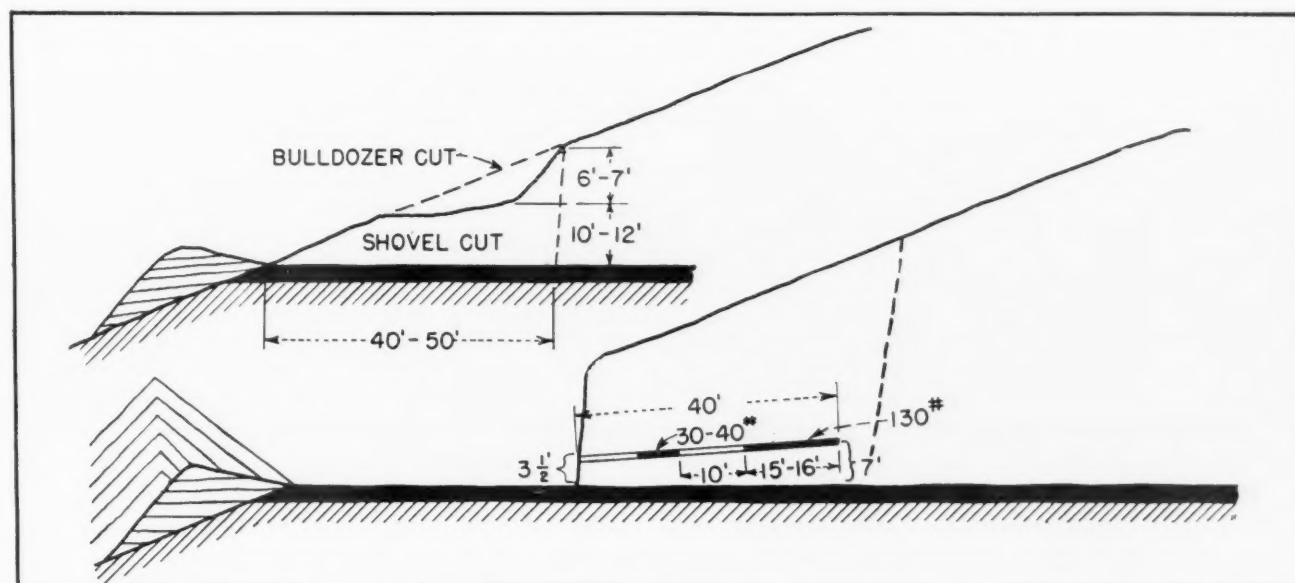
DEVELOPMENT AND SHOOTING plans, No. 2 side.
